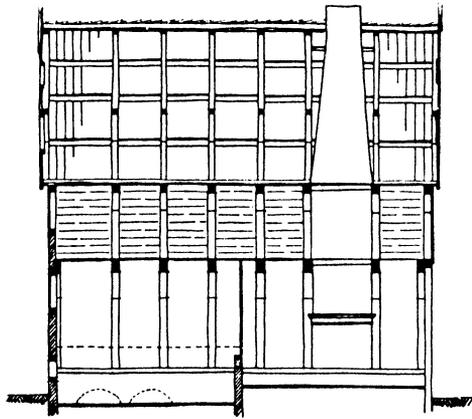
Netherlands two story anchor-bent framing with clapboards. De Rijp, North Holland, ca. 1650. (Drawing, Henk Zantkuyl.)
